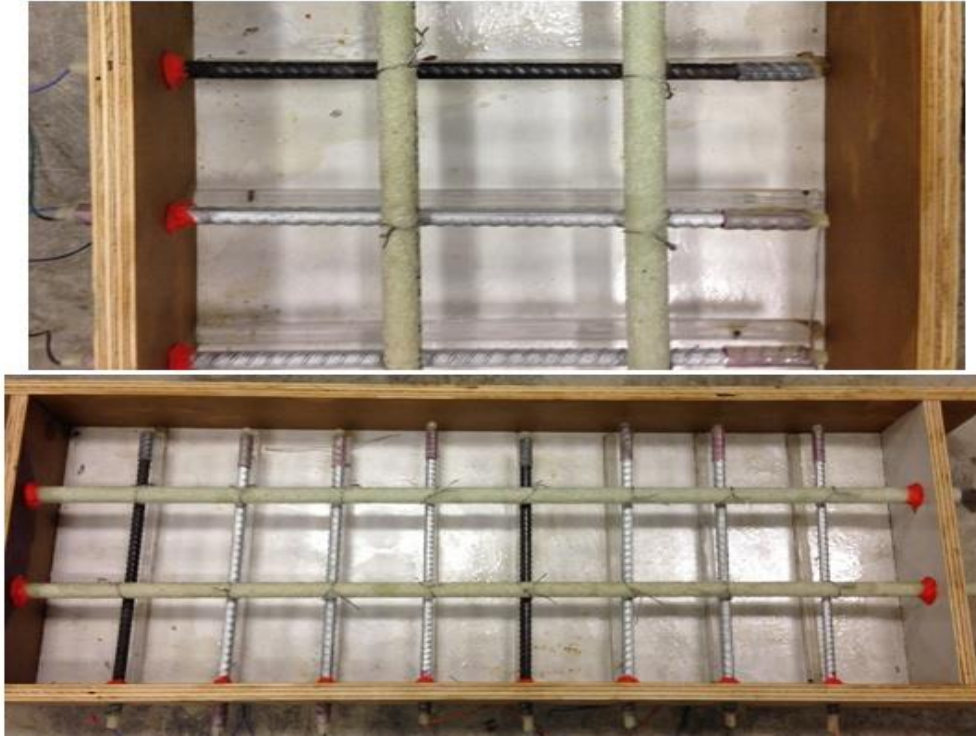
Formwork for longitudinally cracked specimens with rebar in place.
